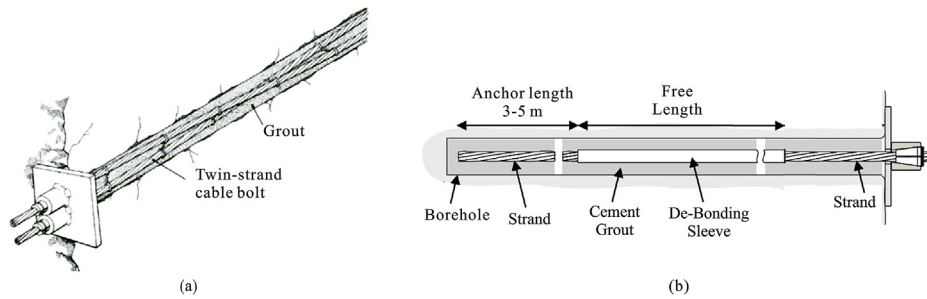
(a) Plain cable bolt [24] and (b) partially de-bonded yielding cable bolt, modified from Thompson [28].
